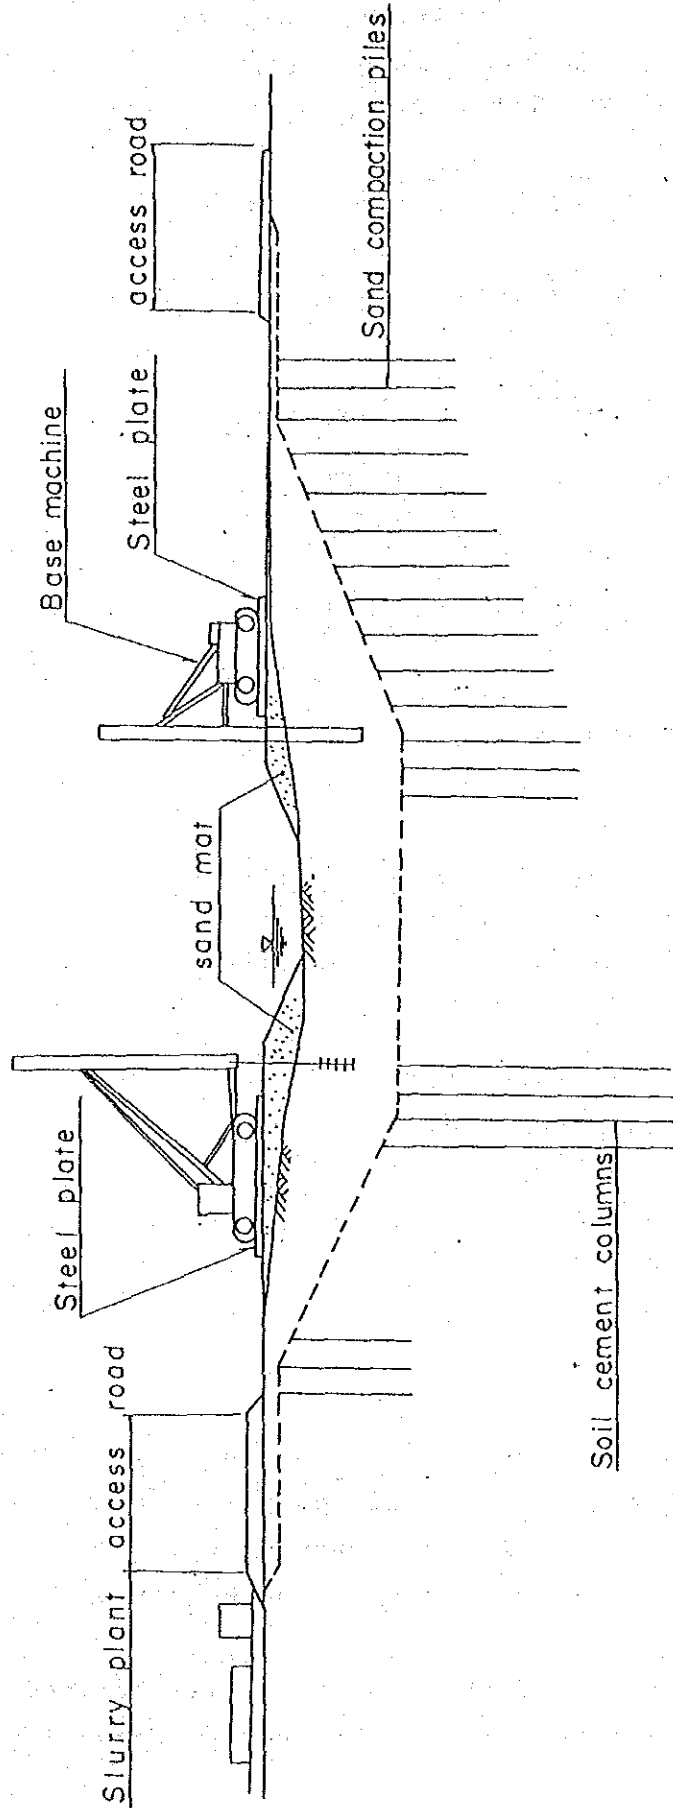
Temporary Work for Foundation Improvement Work
